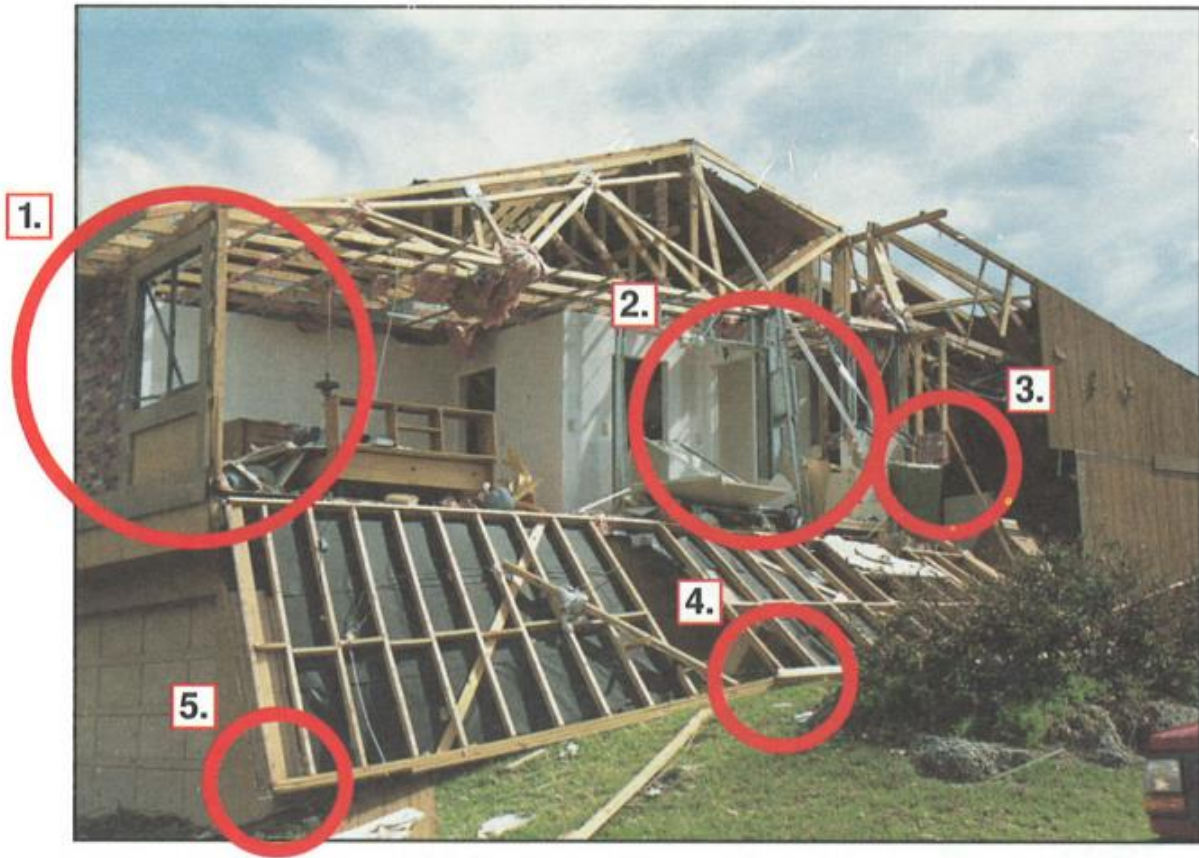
Failure of non-loadbearing wall. Connections of exterior wall were not adequate.
